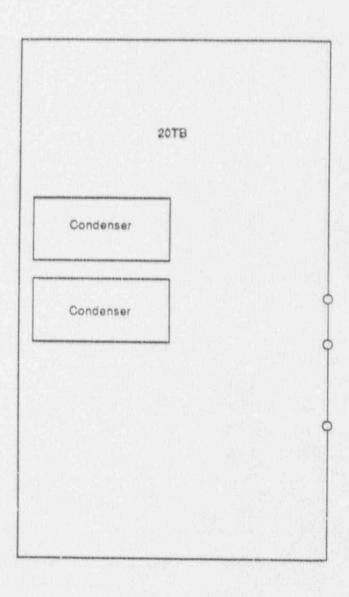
Rancho Seco Turbine Building, Elevation 20 ft.
